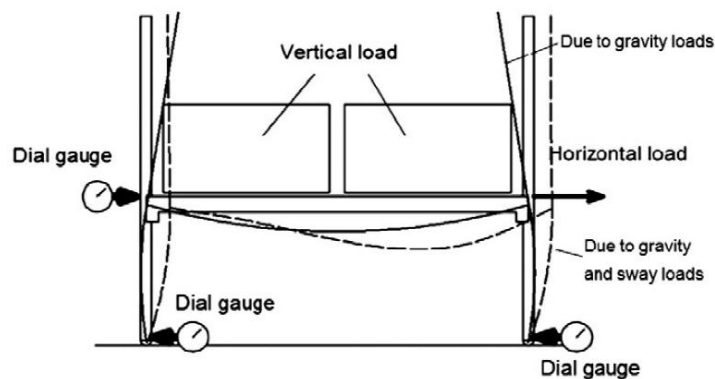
Portal frame setup test for beam end connector test (Zhao *et al.* 2014)
